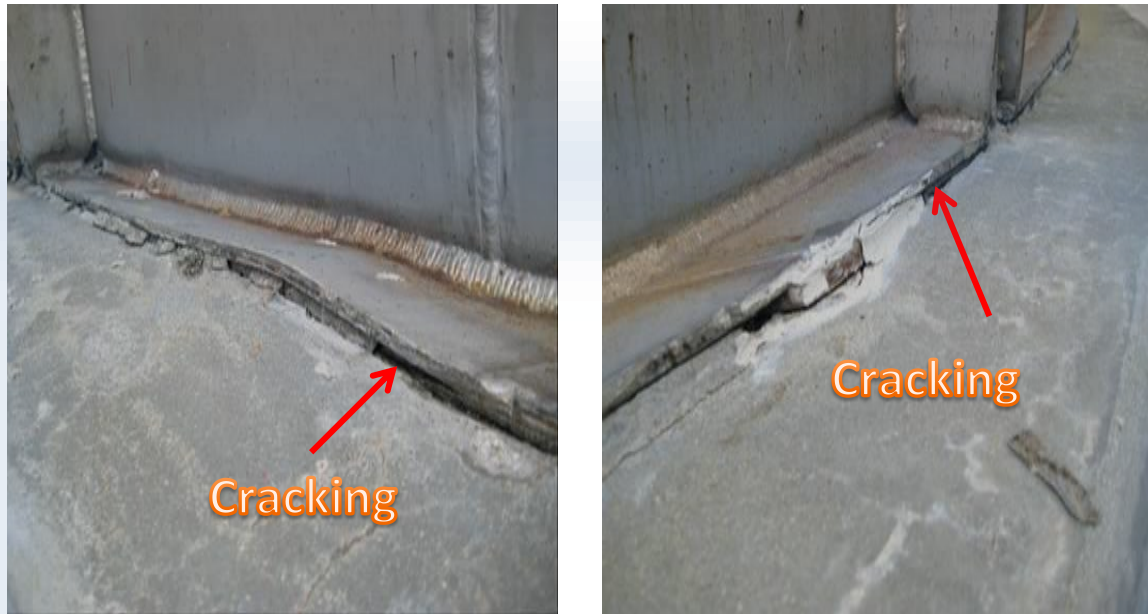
Photographs illustrating the cracking about bottom plate of tank with foundation concrete tank.
